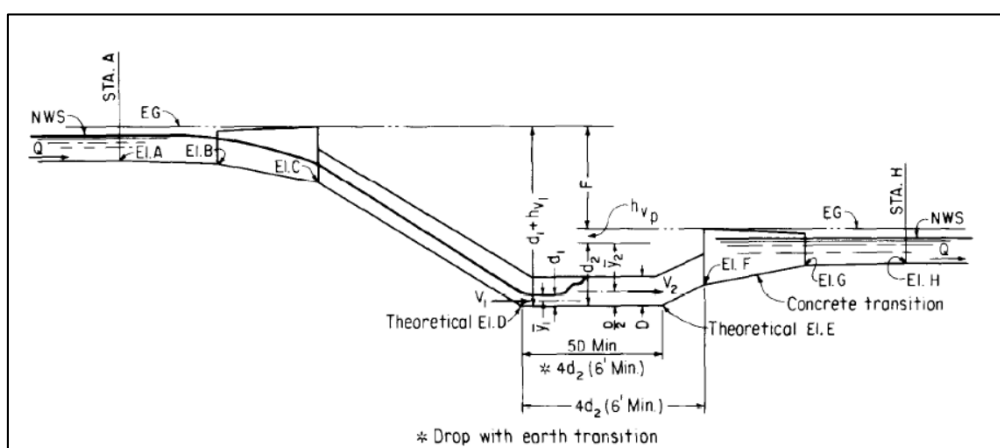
Typical section and hydraulic design steps of pipe drop
